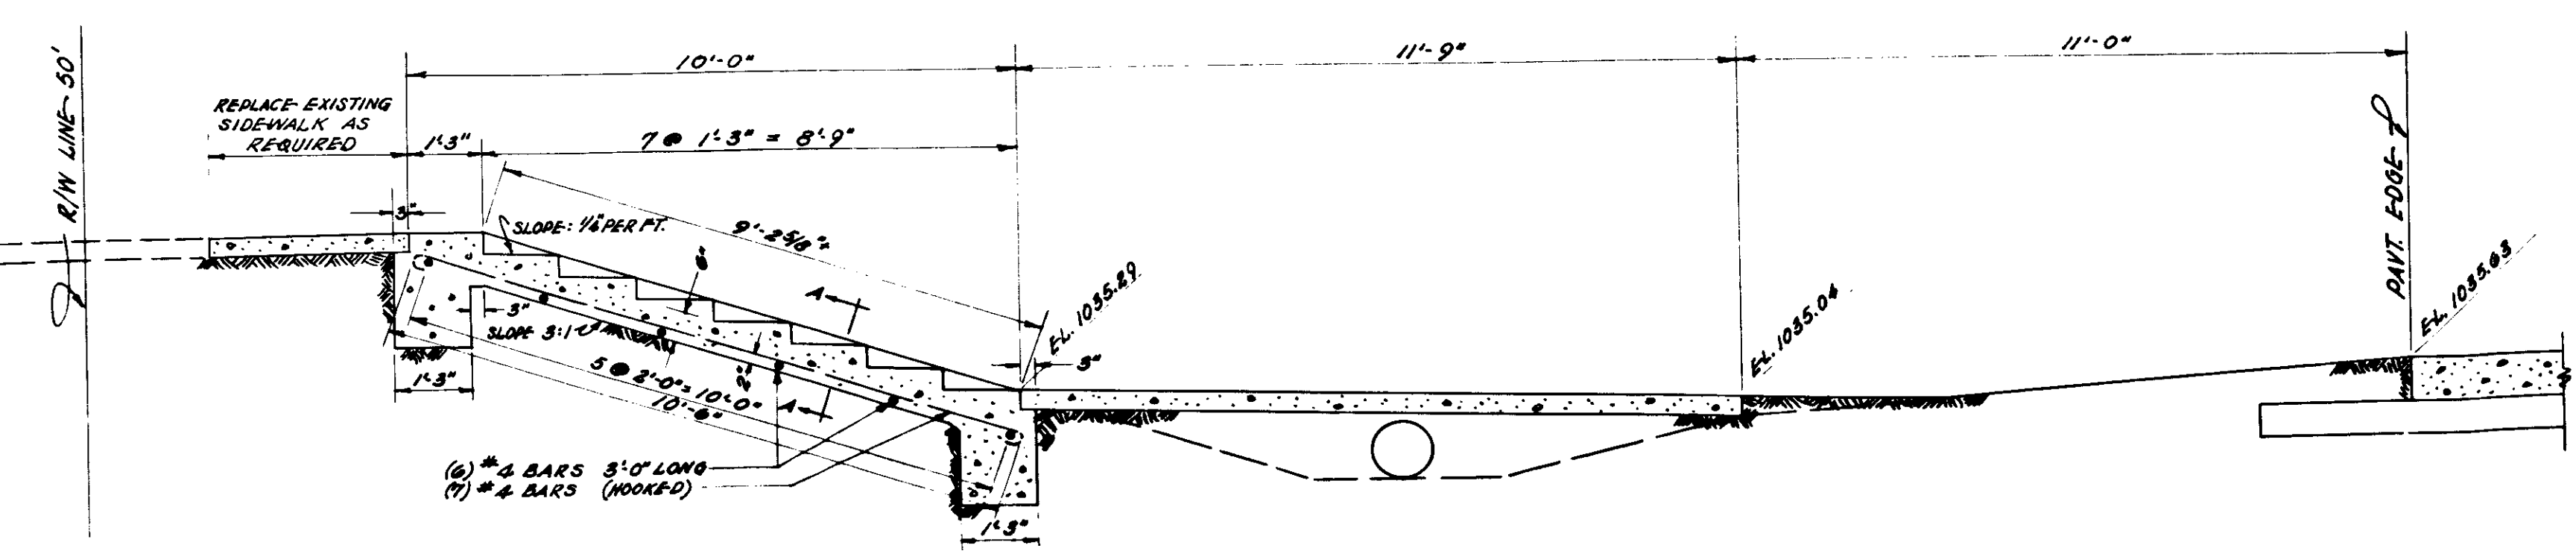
DETAIL OF CONCRETE WALK & STEPS RT. STA. 590+54
